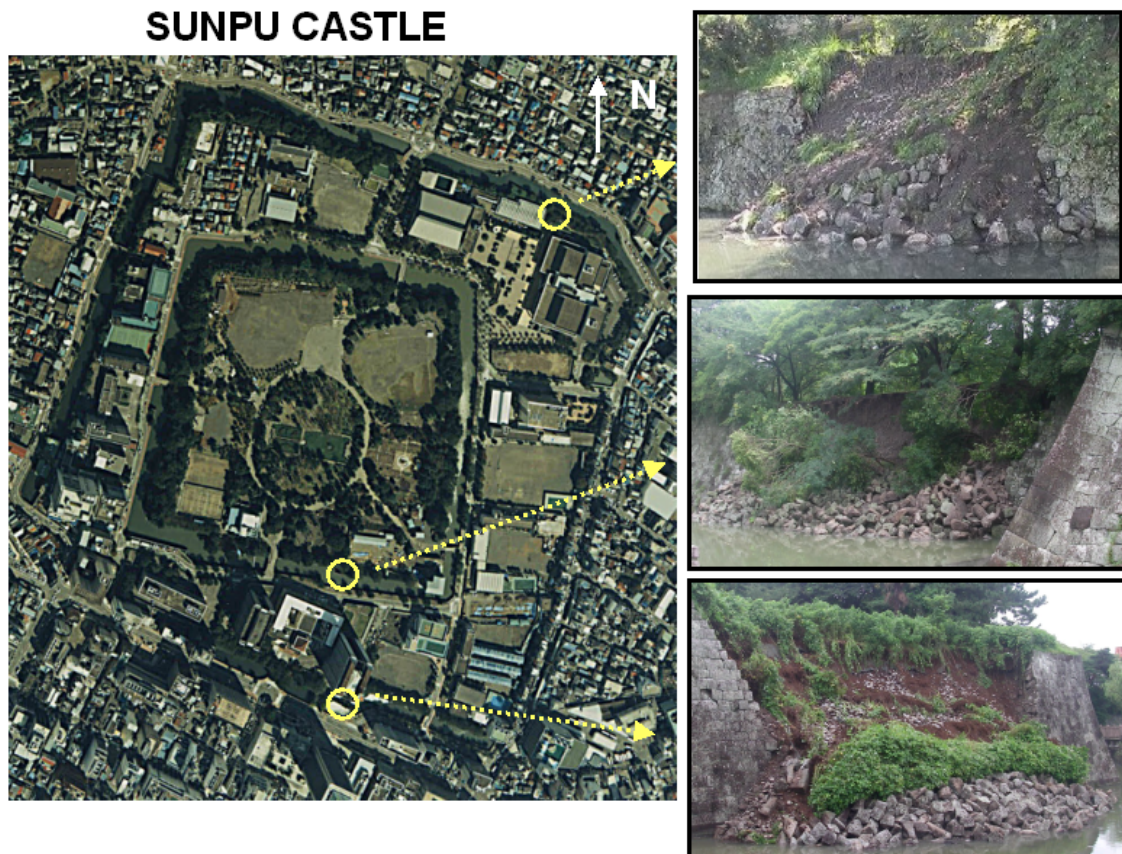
An aerial view of Sunpu castle and views of failed retaining walls
